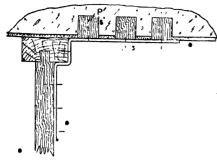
Brass Strap and Wall Plugs to . Overdoor.
